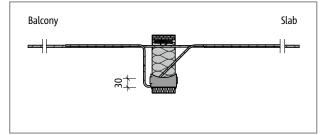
Schöck Isokorb® T type K-M5 to M6: Cross section of the product
